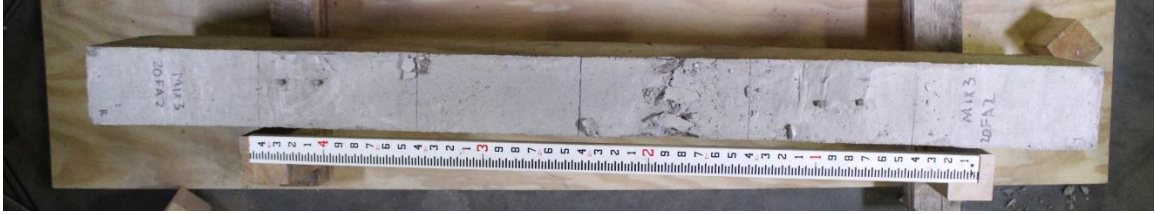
Mixture 3 (20FA2) beam #1R: concrete beam top view.
